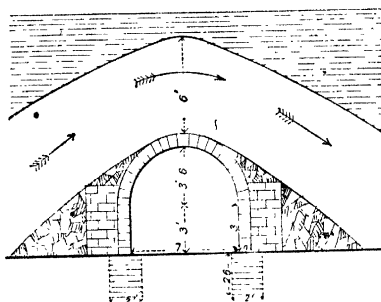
BRICK-ARCH AIR-CROSSING, IN SECTION.
